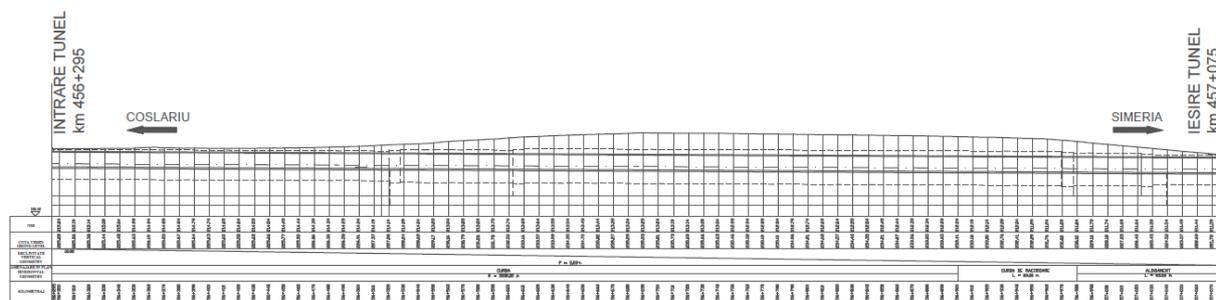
Longitudinal profile – Turdas tunnel <sup>[3]</sup>
